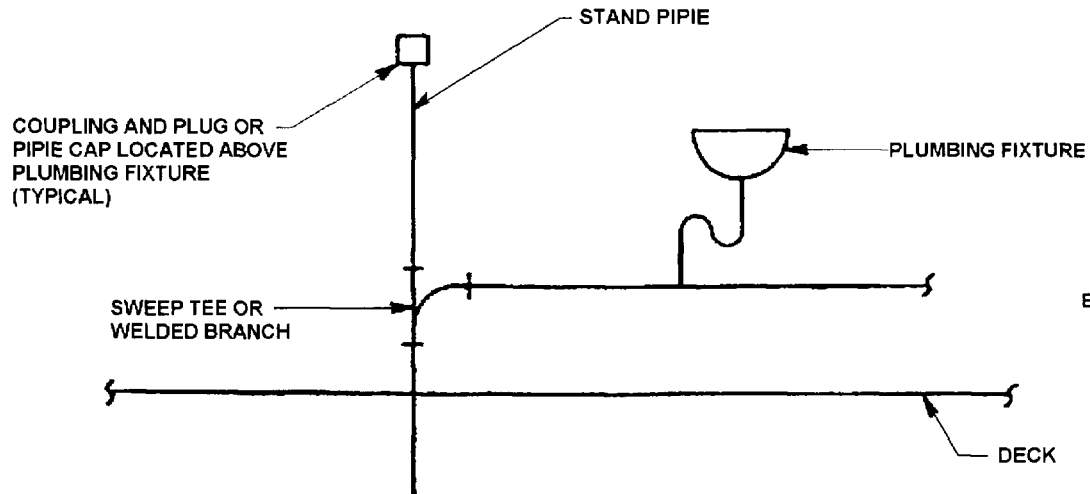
Typical Deck Cleanout Connection Locations (Sheet 2 of 2)
